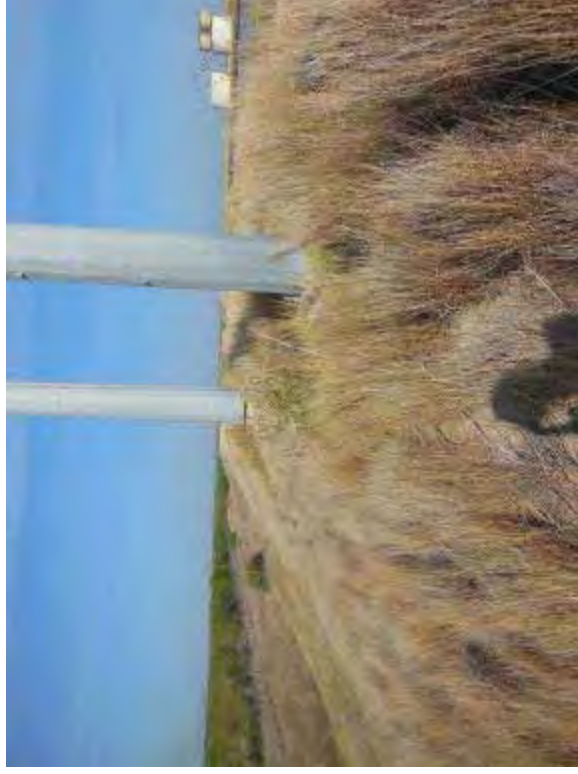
Support poles for overhead power lines at south embankment crest, looking west.
